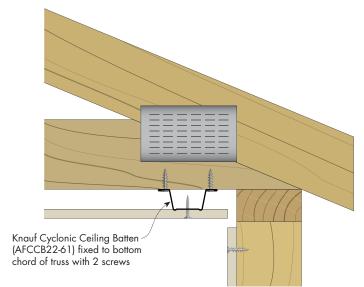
Direct Fix Ceiling to Roof Truss 22mm Cyclonic Batten perpendicular to trusses
